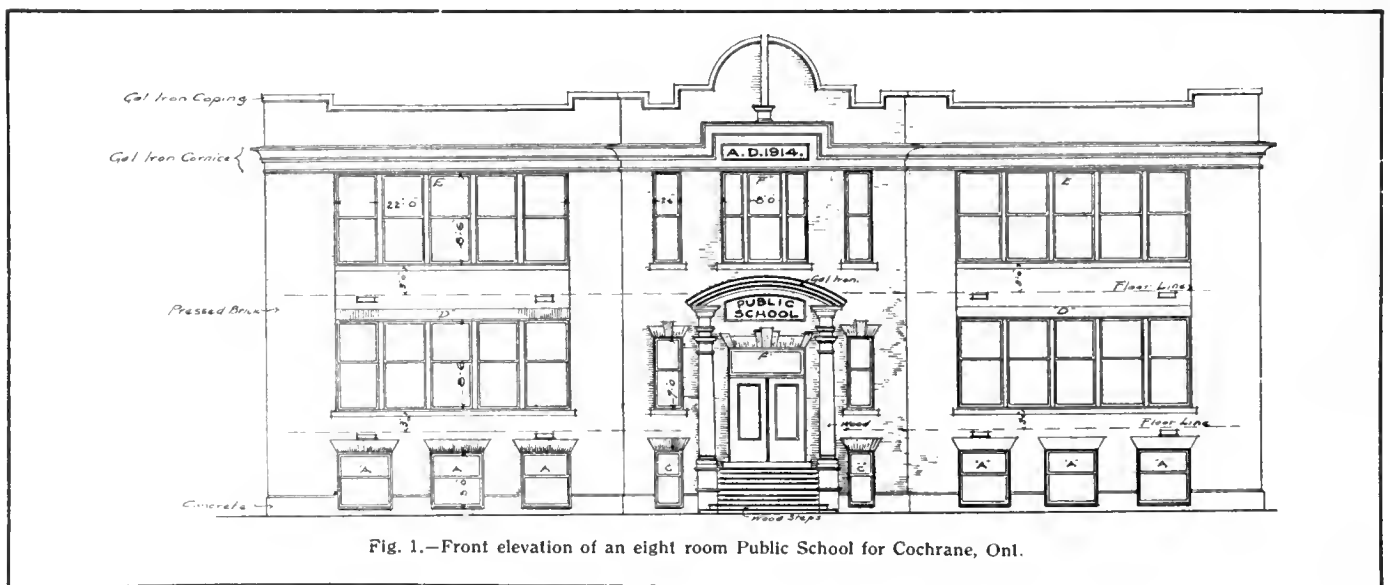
Front elevation of an eight room Public School for Cochrane, Ont.
